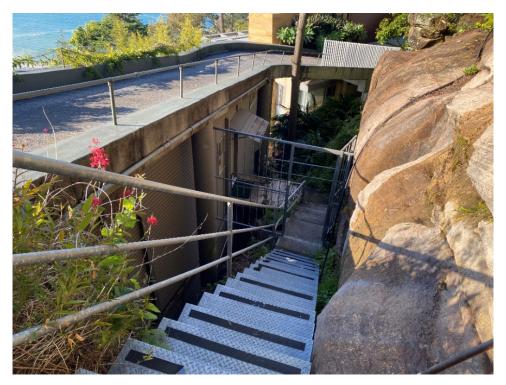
Photo – Pedestrian access from Mitchell Road to the existing dwelling on 6 Mitchell Road is via these stairs.
